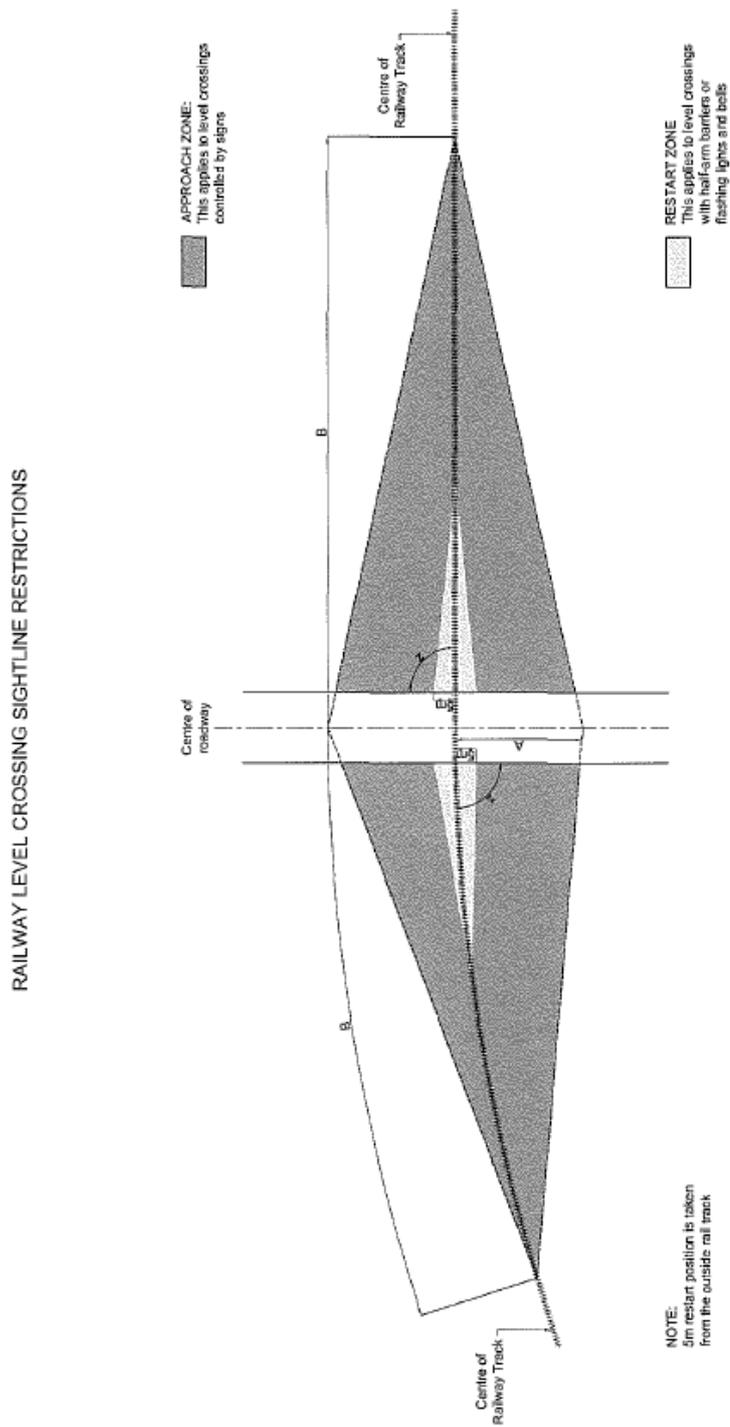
Traffic Sight Lines at Road/Rail Level Crossings and Road Intersections
